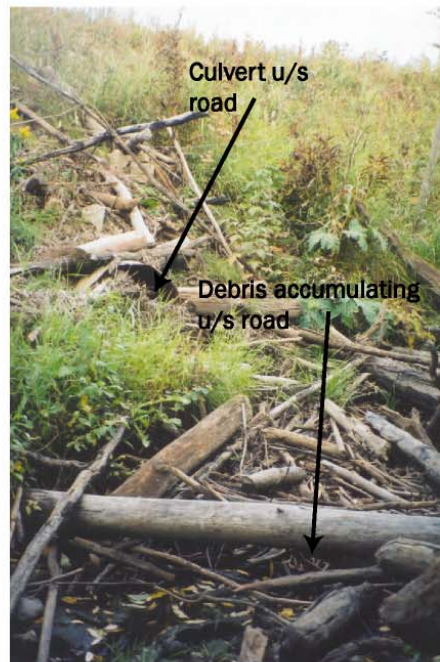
Culvert upstream of road. Note that debris has accumulated upstream of culvert (September 19/2002).
